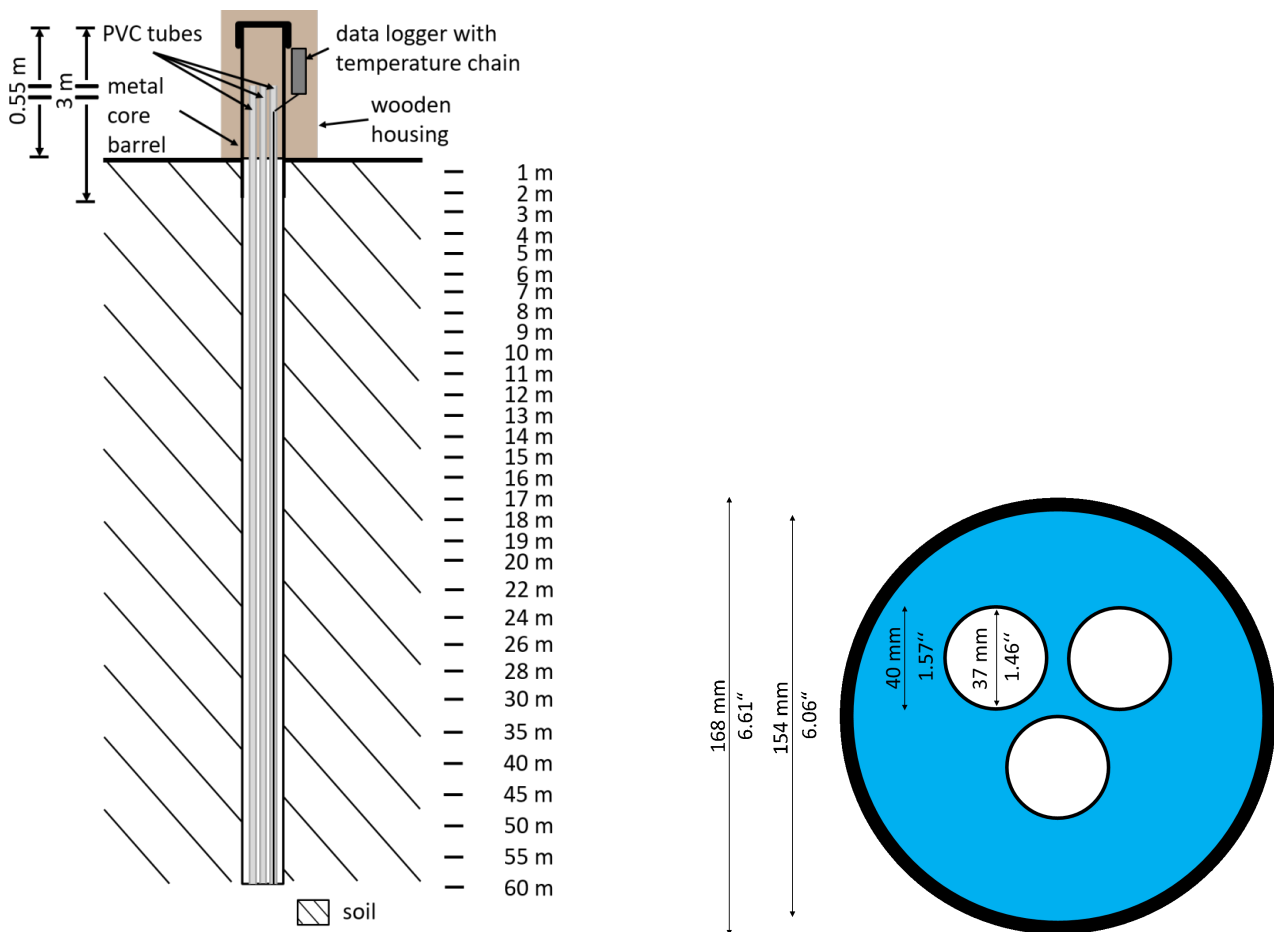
Schematic overview of the borehole a) (side view) borehole with housing and setting of temperature chain b) (top view) borehole with smaller tubes inside for measurement devices
